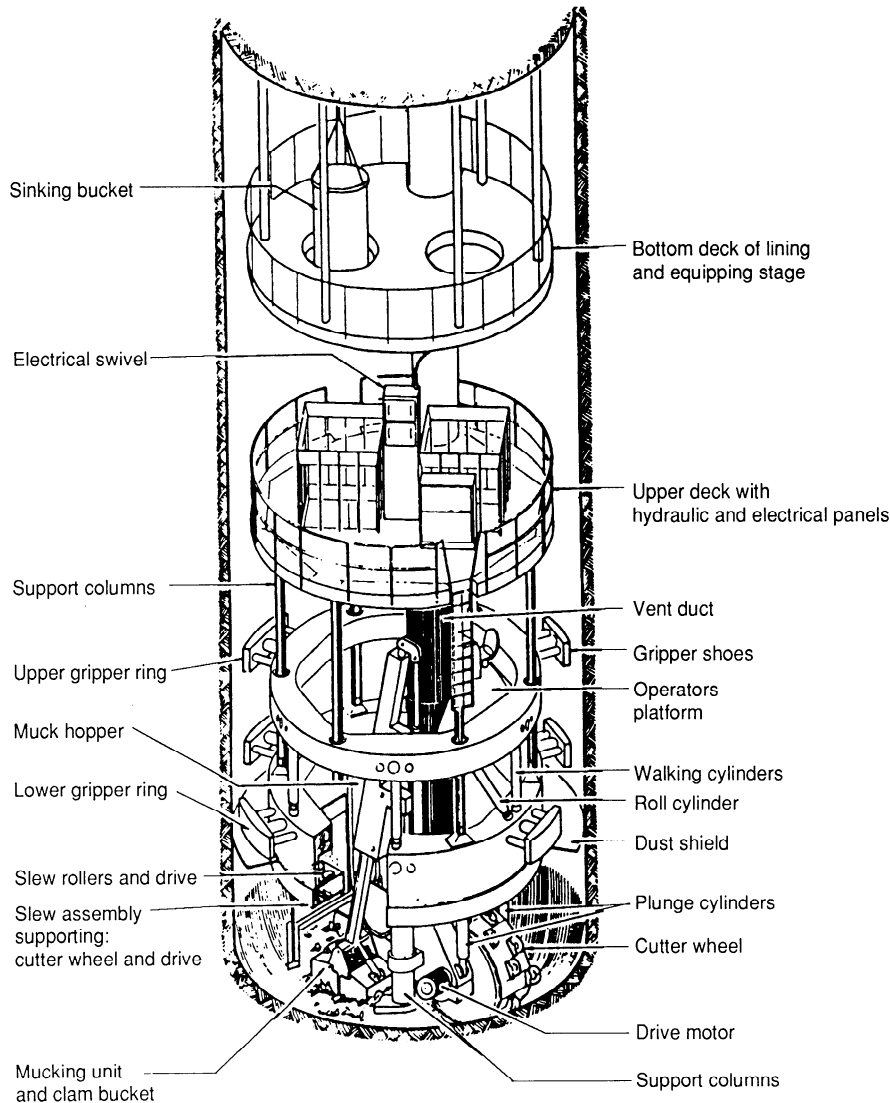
Shaft boring machine, 20 to 24 ft (6 to 7.3 m) (courtesy: Robbins Co., Seattle, WA).
